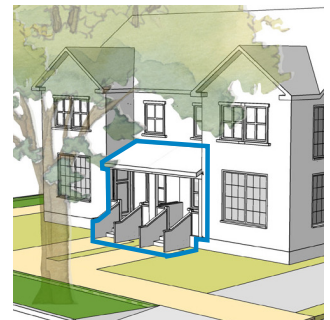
MMH types work best with standards that require the ground-floor facade to face and address a public street.
